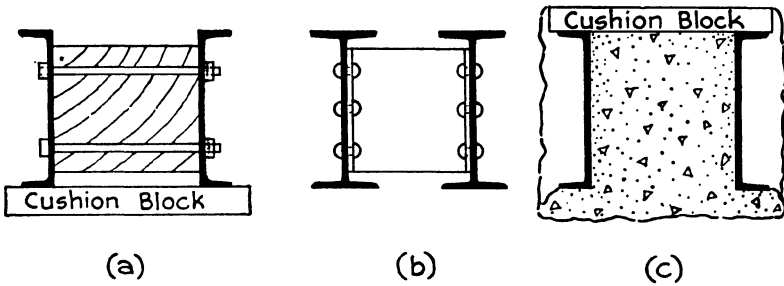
Reinforcing Needles. (a) wood separator; (b) steel plate separator; (c) concrete separator.
